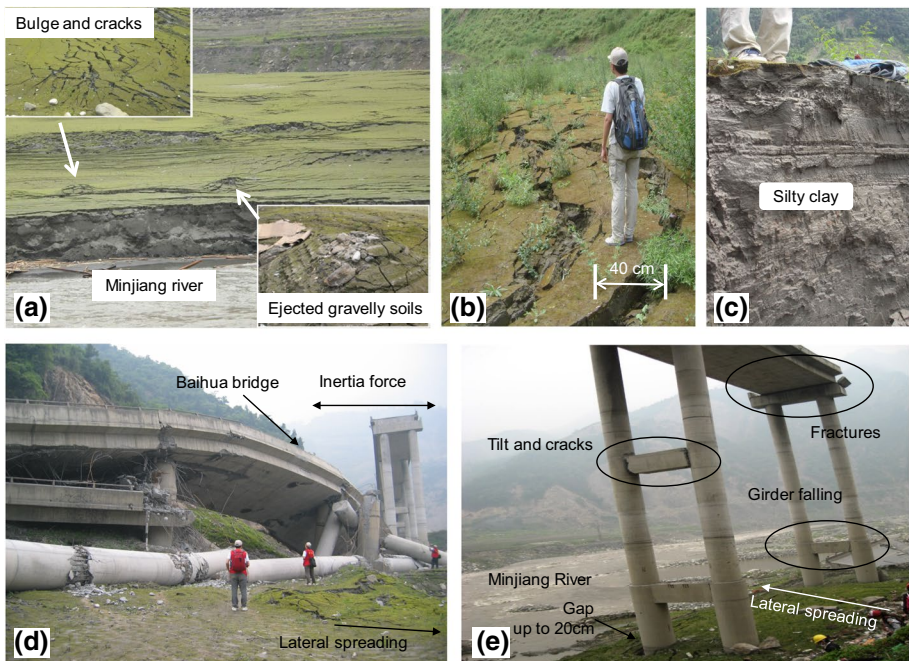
Field manifestations: a ground cracks and soil boils, b large lateral spreading, c the crust layer of silty clay, d collapse of the Baihua Bridge and e pier damage details
